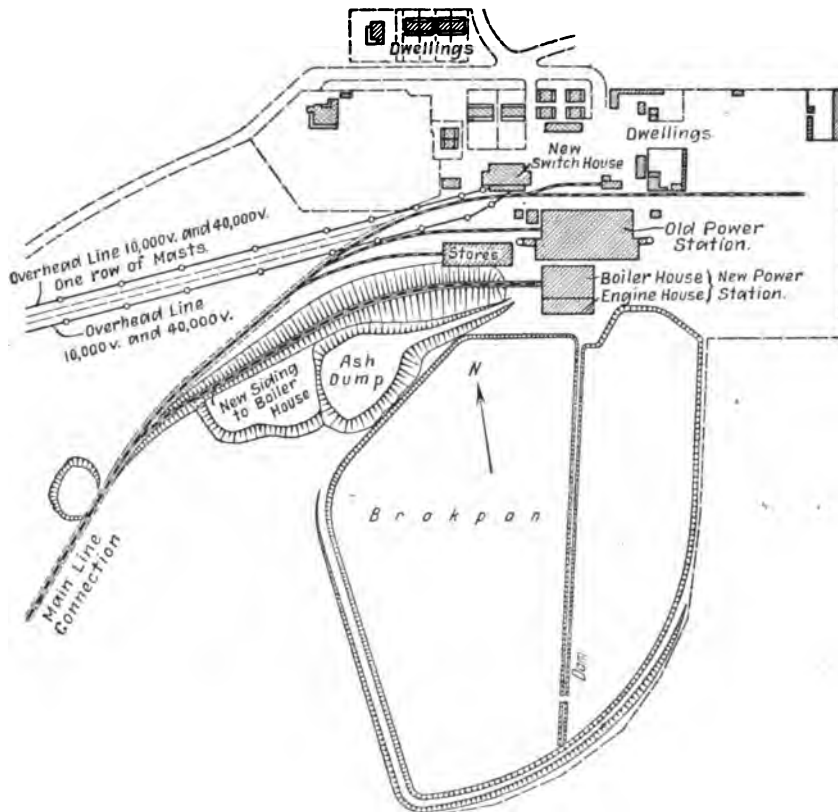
Brakpan Power Station. Plan scale, 1 to 5,000.
